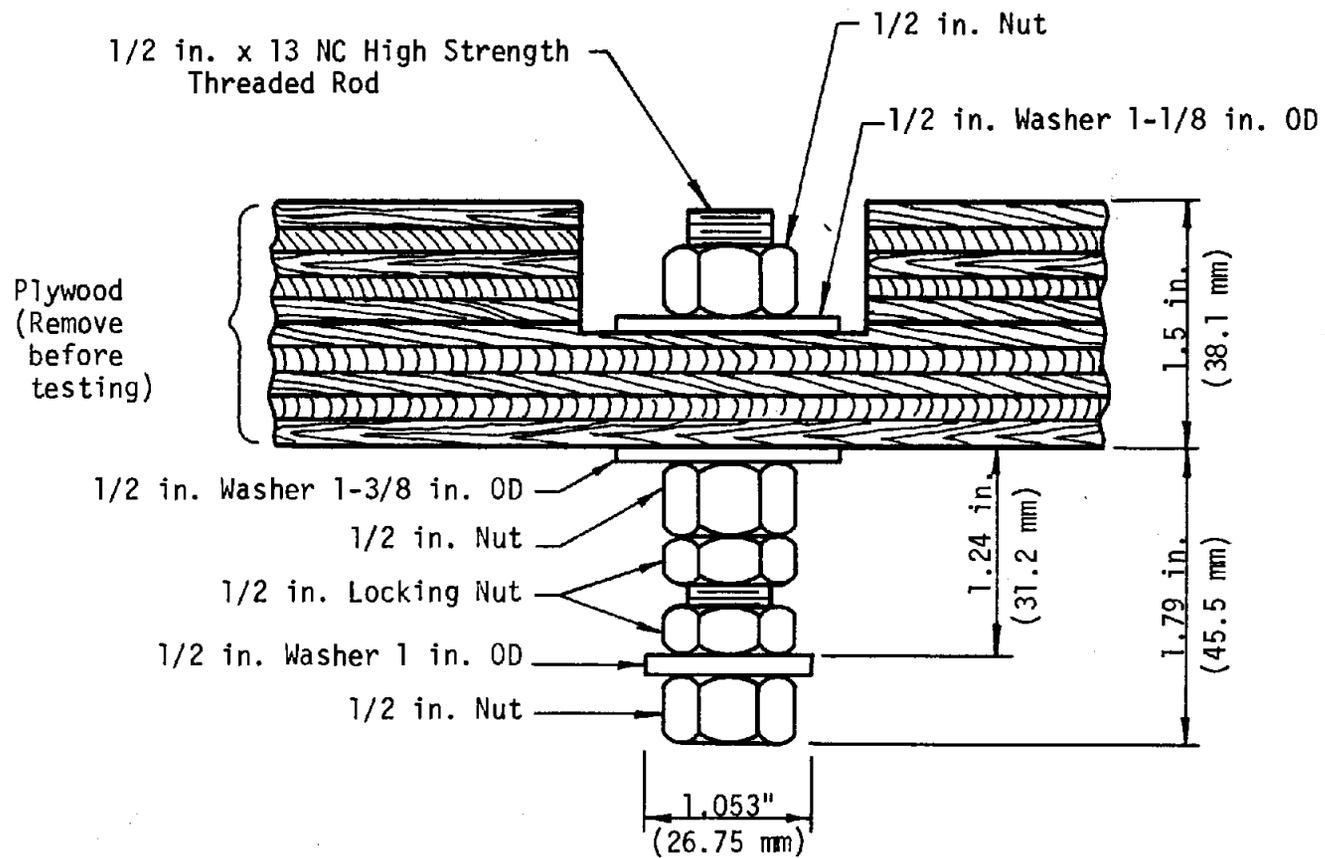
DETAIL OF PULL-OUT ANCHOR
